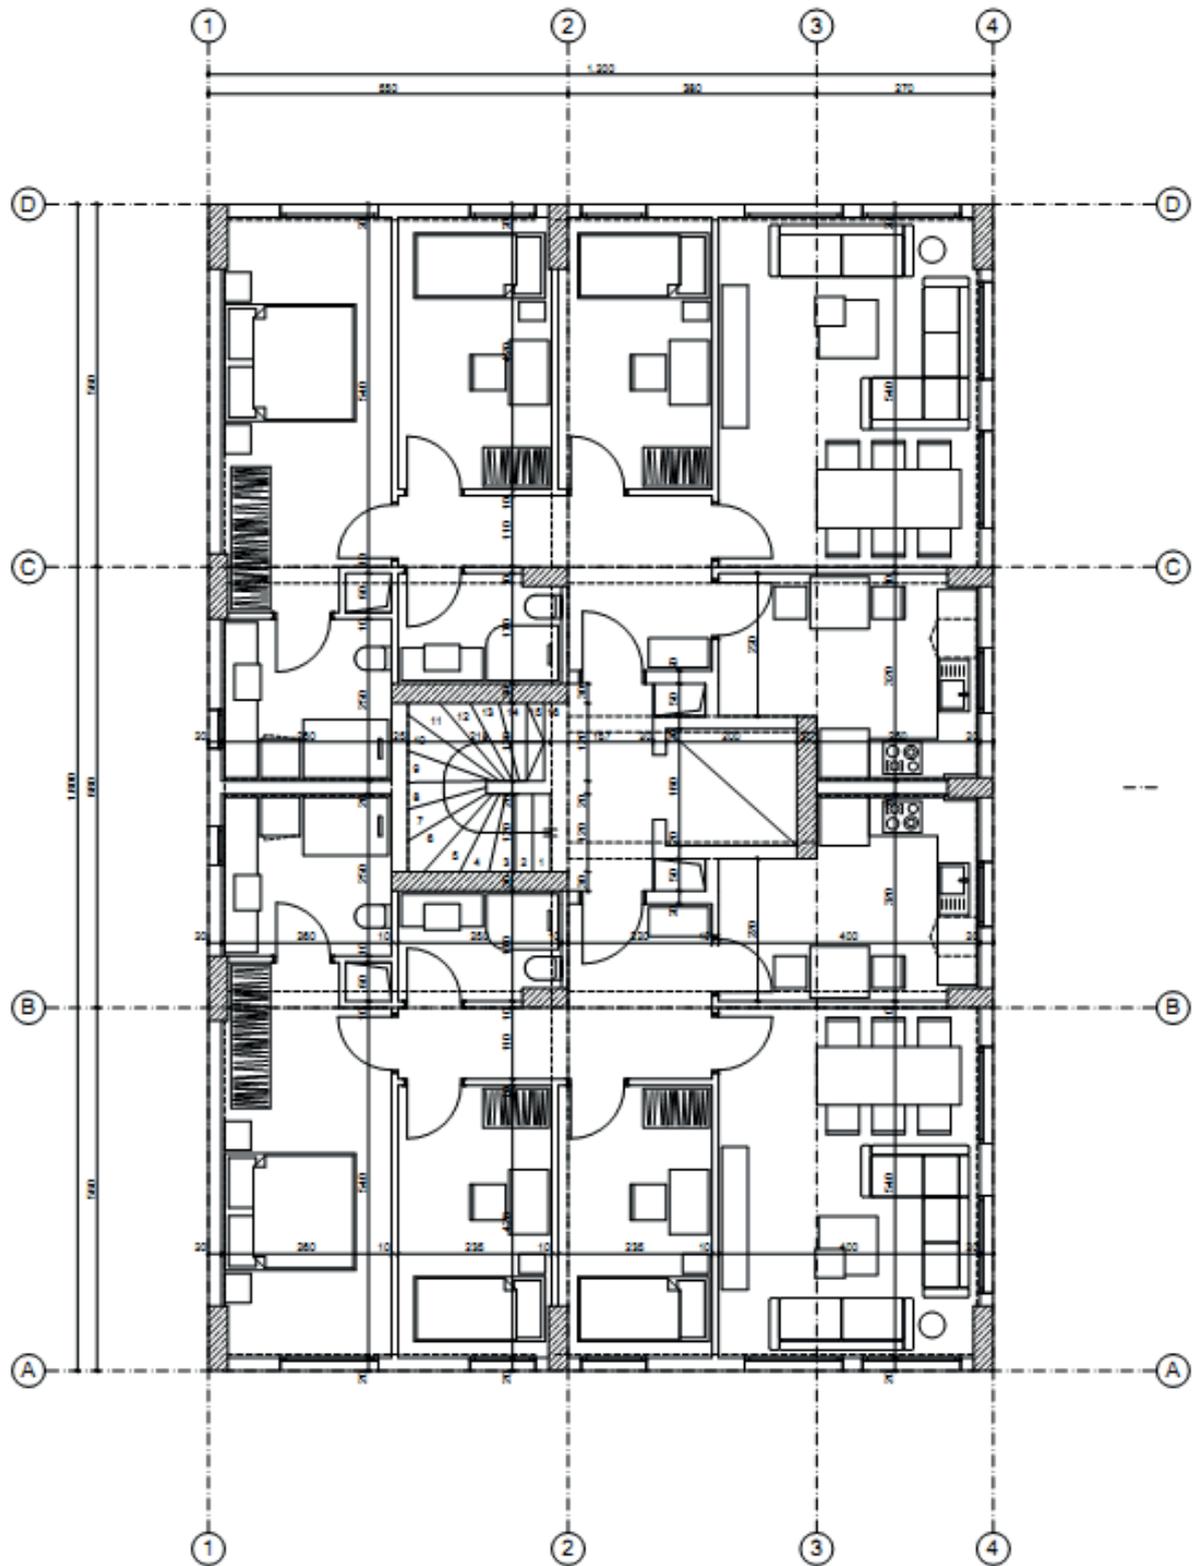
Floor plan of a building with an irregular layout (Model 3)
